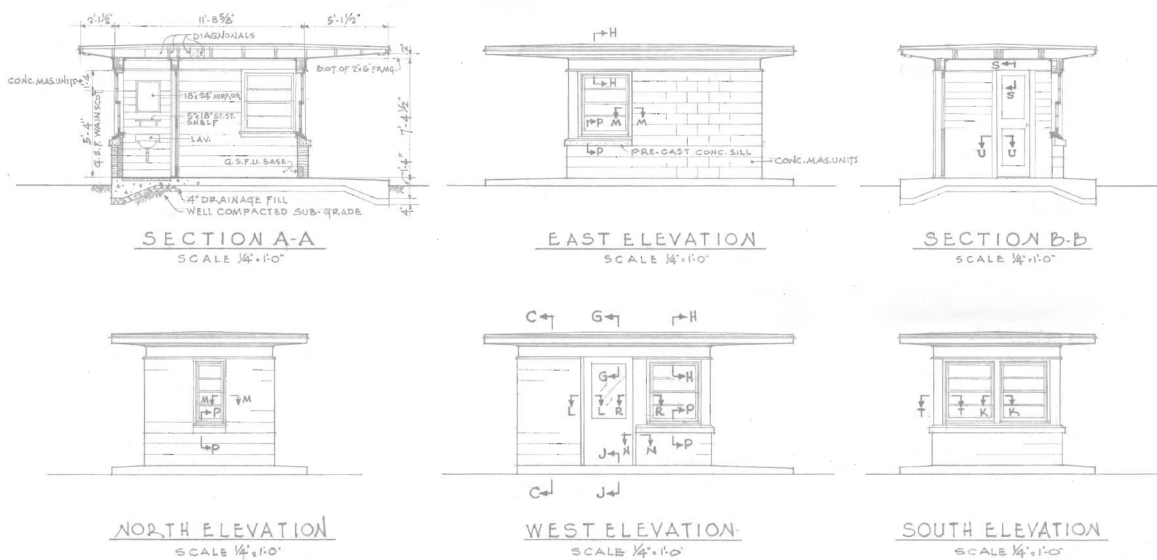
Property 24025, elevation and section drawings from 1959 WS-IO plans.
